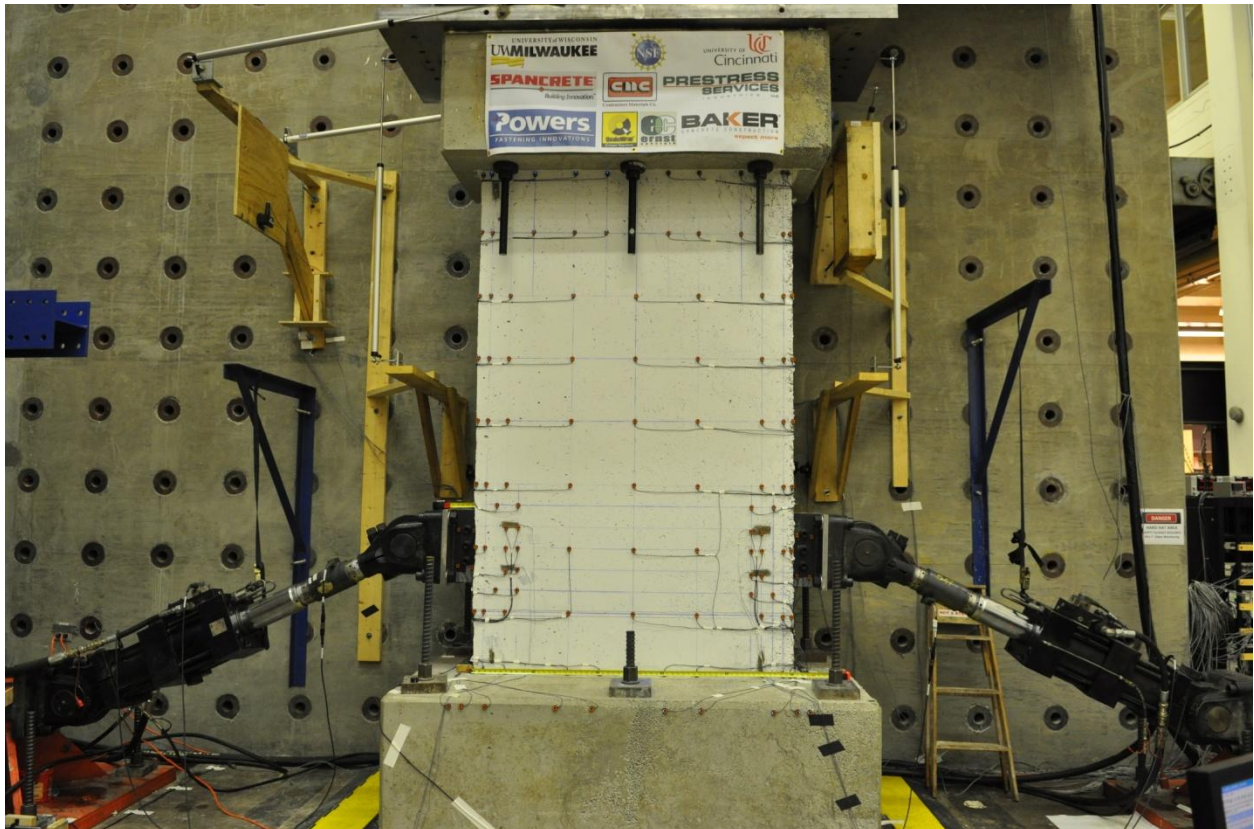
Photo of Wall Footing and Floor Post-tensioning Holes
